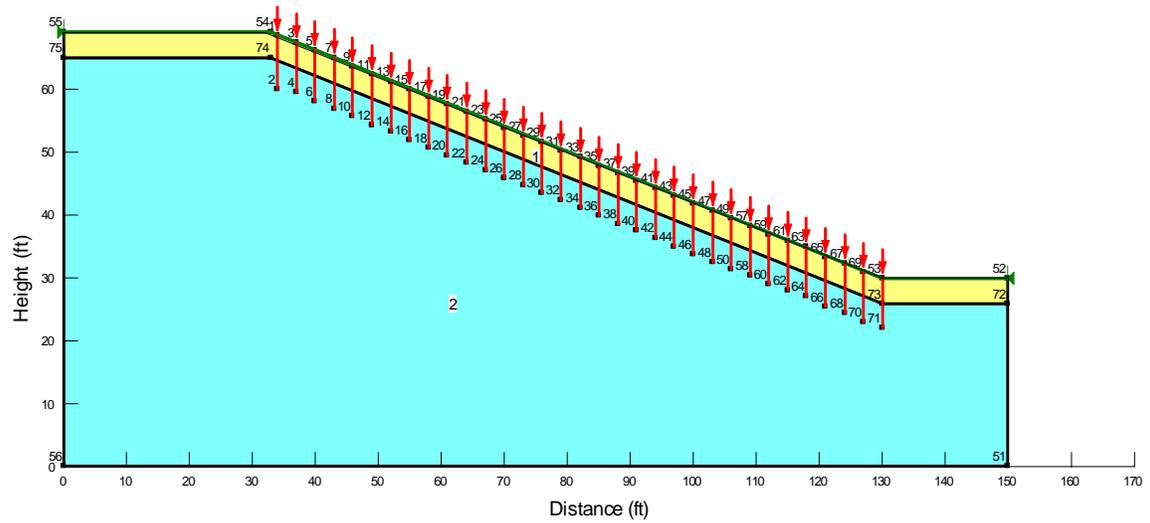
Geometry of STH-164 highway slope that consists of an upper soft soil layer over a stiff soil layer stabilized with vertical structural members.
